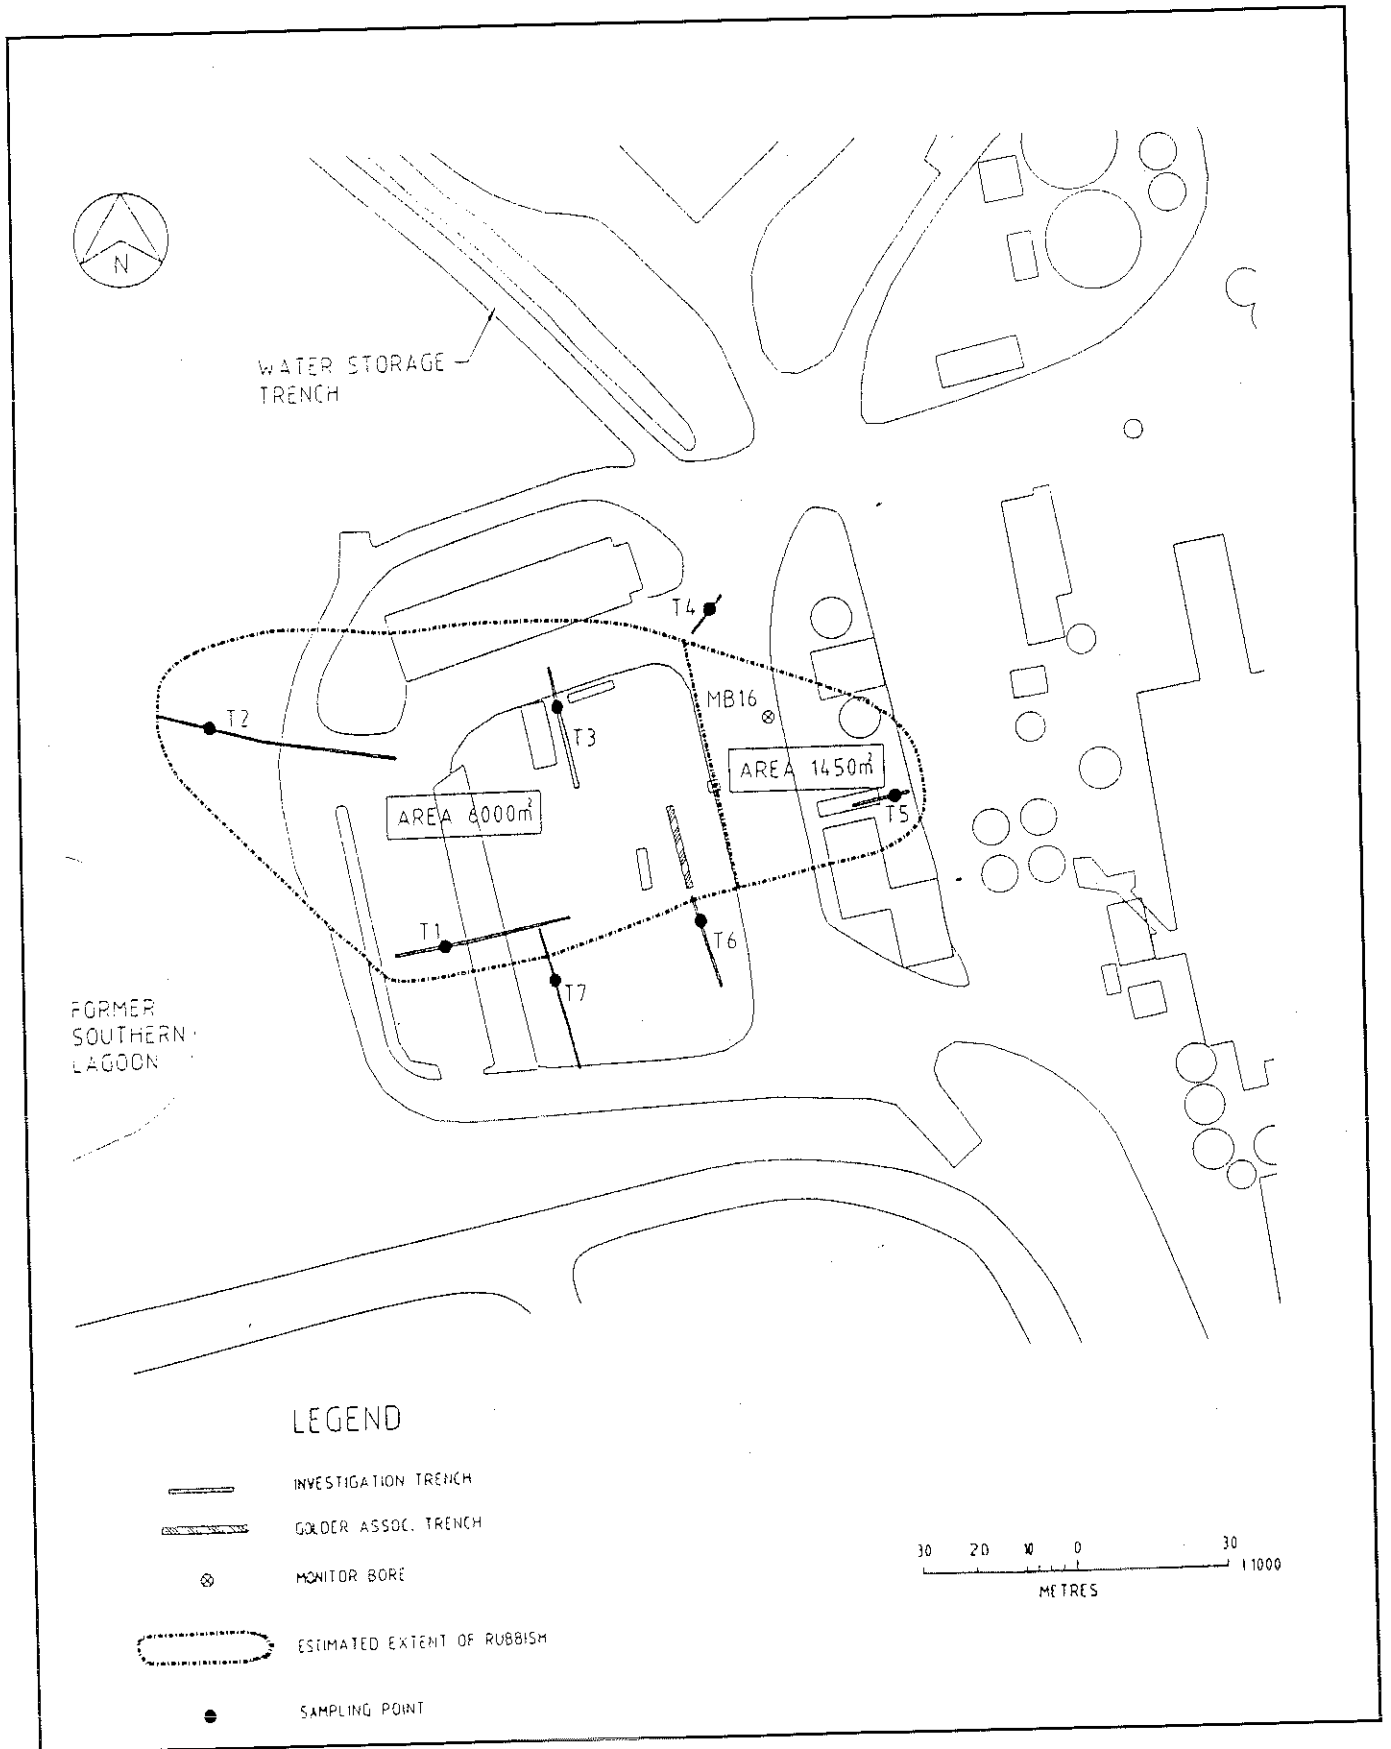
Swan Portland Cement location of rubbish dump containing buried kiln bricks.
